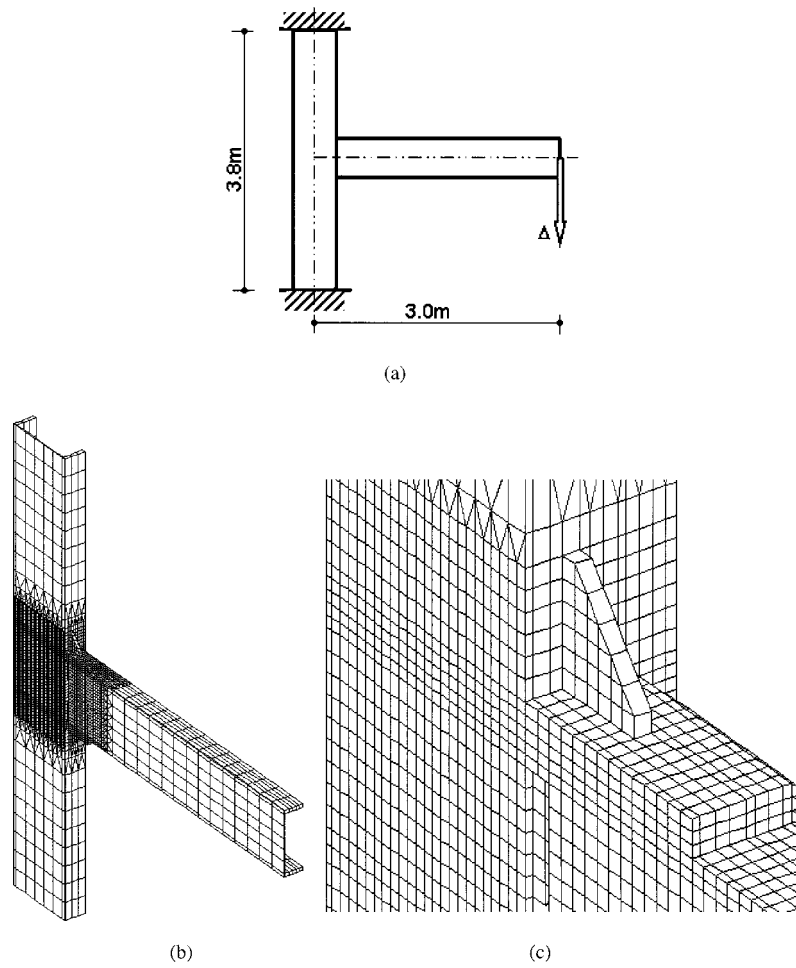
(a) Beam–column subassembly considered in this study, (b) finite element model of symmetric half of beam–column subassembly (beam W21×142, column W24×160), and (c) details of finite element model showing discretization of connection reinforcement region
